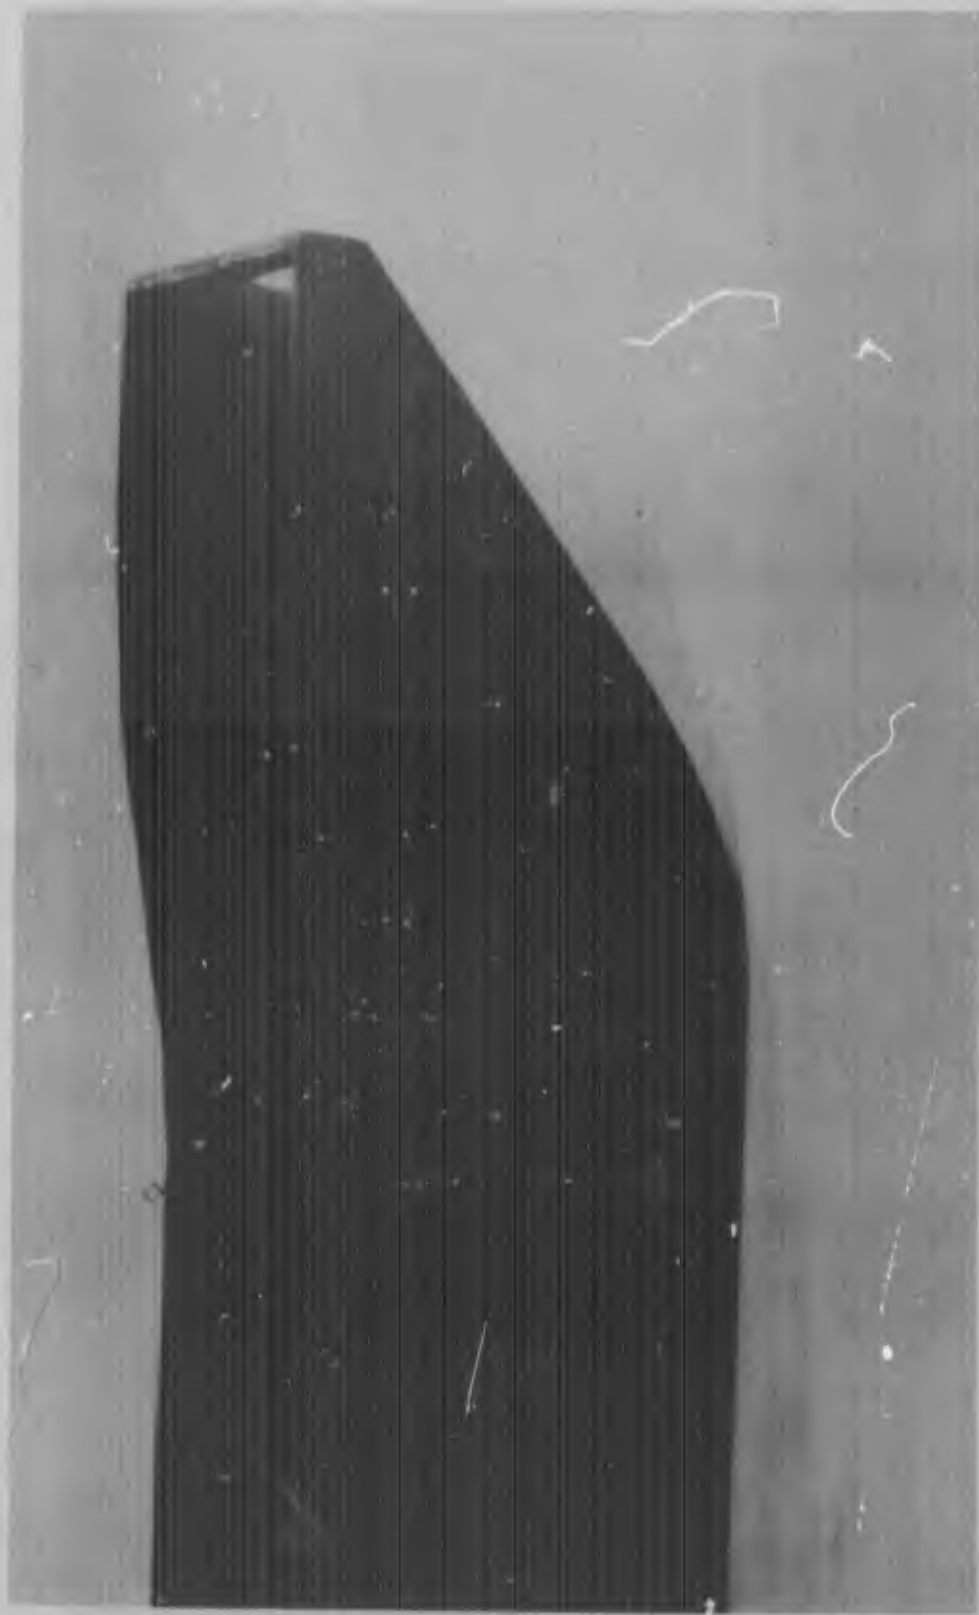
DETAILS OF THE REVISED DESIGN PONTON
